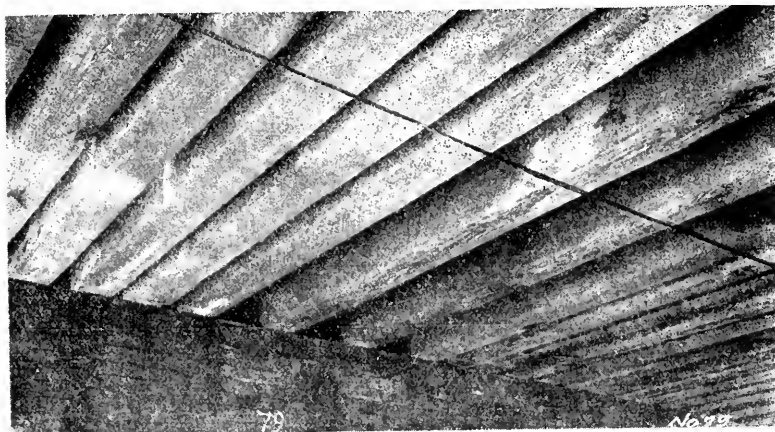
Trestle 60-B, Southern Pacific, Oakland to Tracy, 240 feet, CSB-4. Constructed of creosoted Douglas fir 1900. Contains 17 bents, 6 of the bents, 6 piles each, the remainder 4. New caps applied 1927. 12 x 14's laid flat. Some new guard timbers have been applied, replacing original guard timbers broken unloading riprap. Photographed August 7, 1928.
